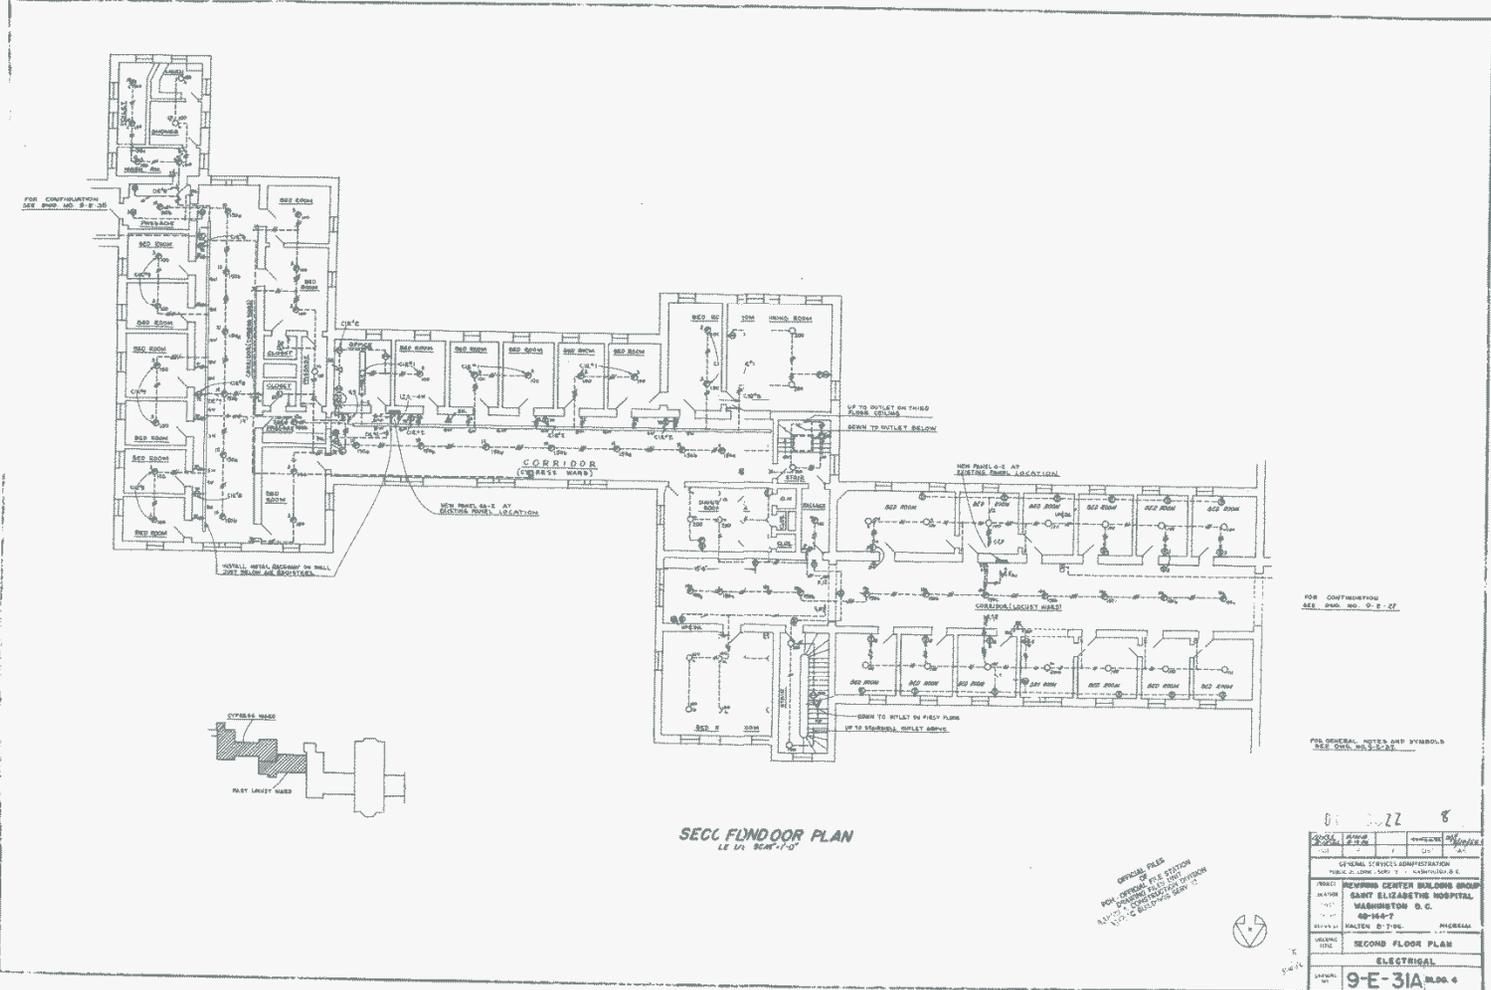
Second floor plan of the East Wing outlining electrical system improvements, 1956. Source: GSA archives, image DC0080SE0008.
